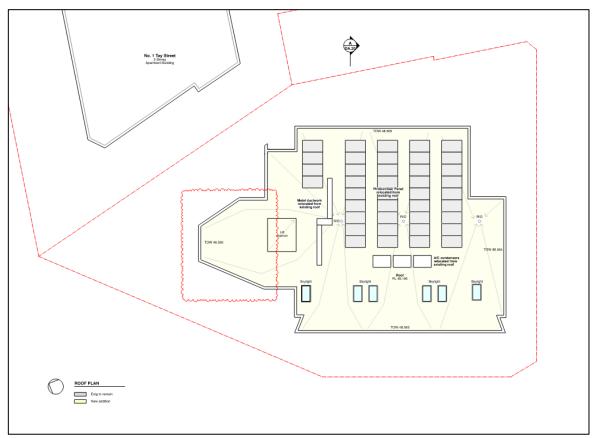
Proposed Roof Plan for 2 Anzac Parade, Kensington (Source: Applicant)
